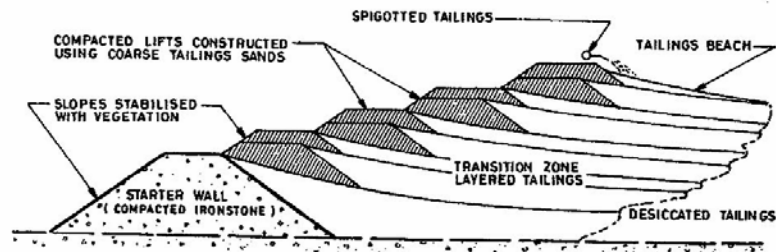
Section of bauxite tailings embankment at Weipa showing upstream construction (Minns, 1988, reproduced with permission of ASCE).
